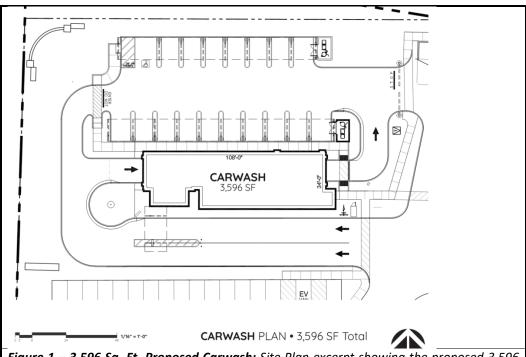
3,596 Sq. Ft. Proposed Carwash: Site Plan excerpt showing the proposed 3,596 sq. ft. freestanding carwash
